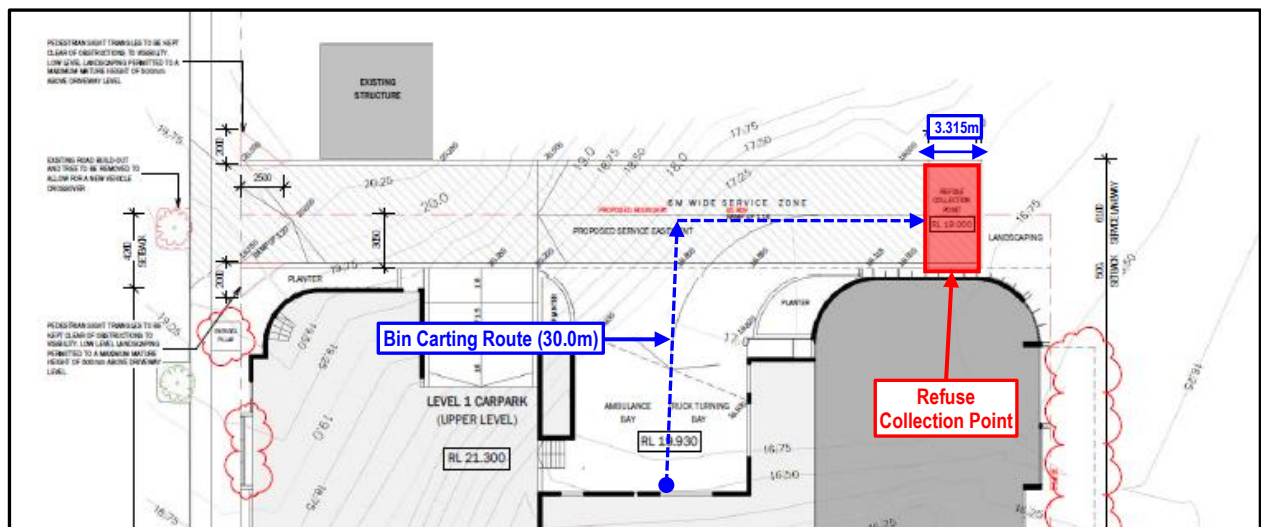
Refuse Collection Point and Bin Carting Route
